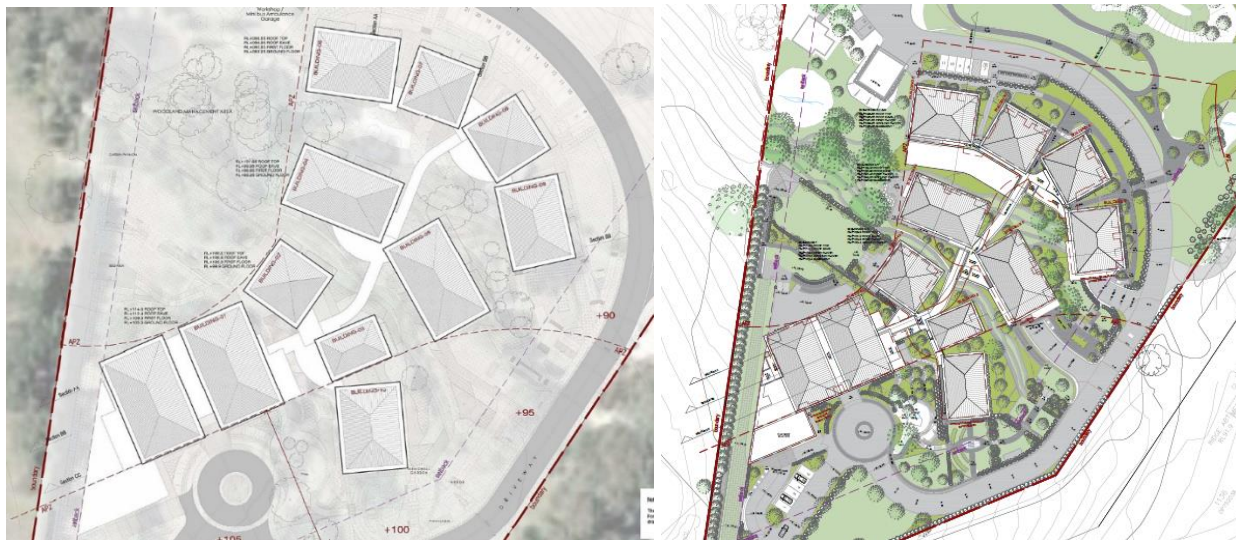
Site plan, with previous approved building locations (left) and proposed building locations (right)
